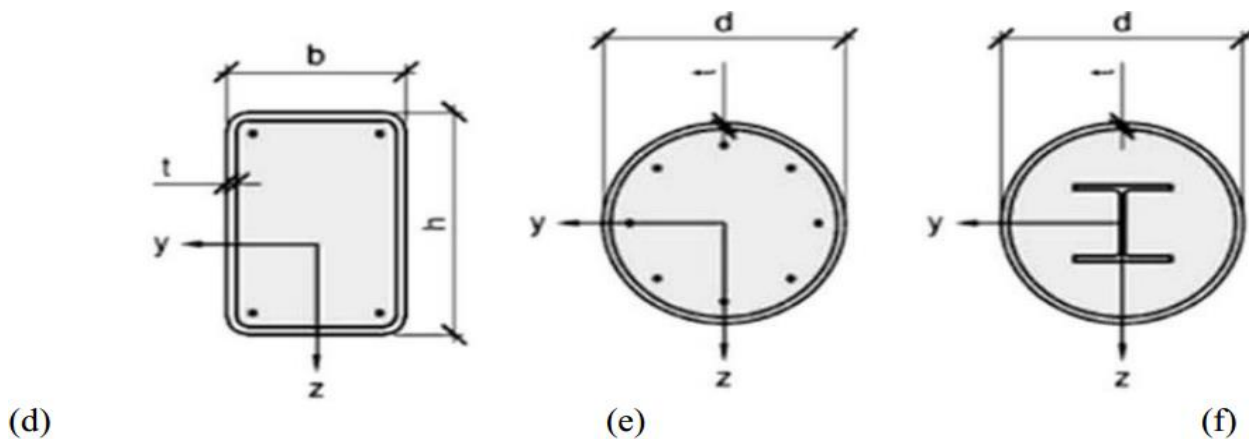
Typical Cross-Section of Composite Columns with Concrete-Filled Hollow Section(ES EN 1994, 2015)
